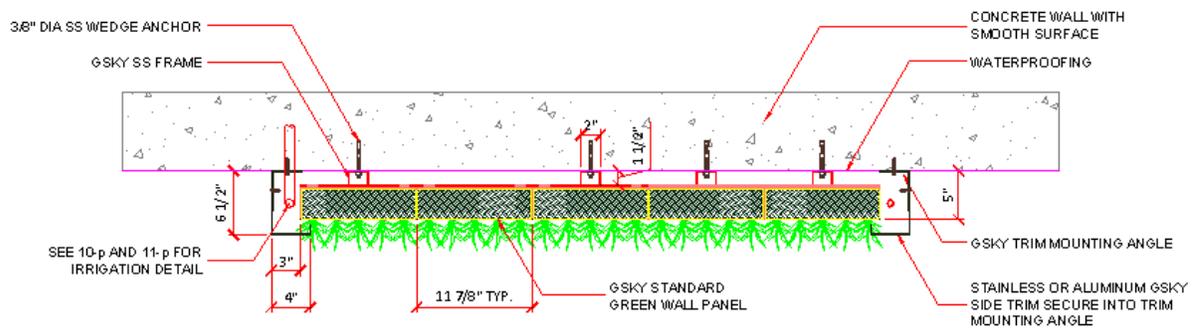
Green walls plan. (GSKY Green Wall Panels, 2010).
